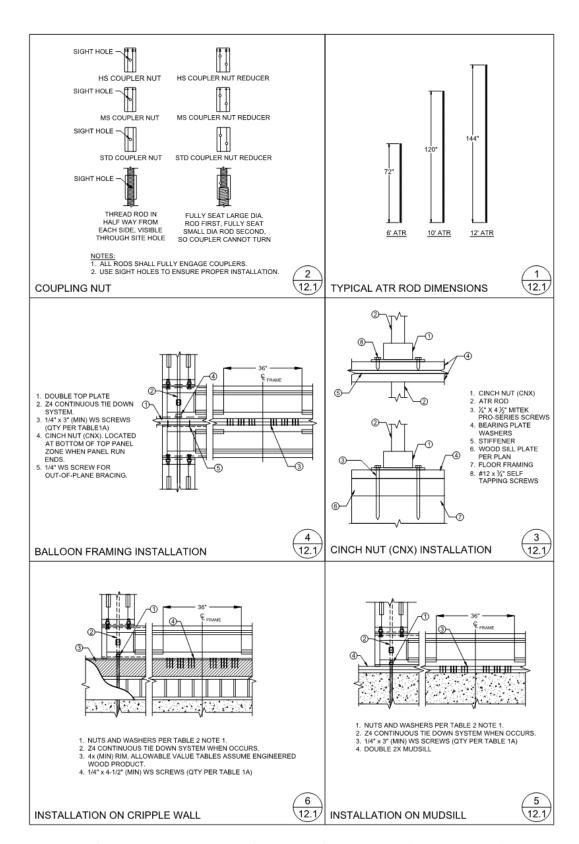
ADDITIONAL INSTALLATION DETAILS
